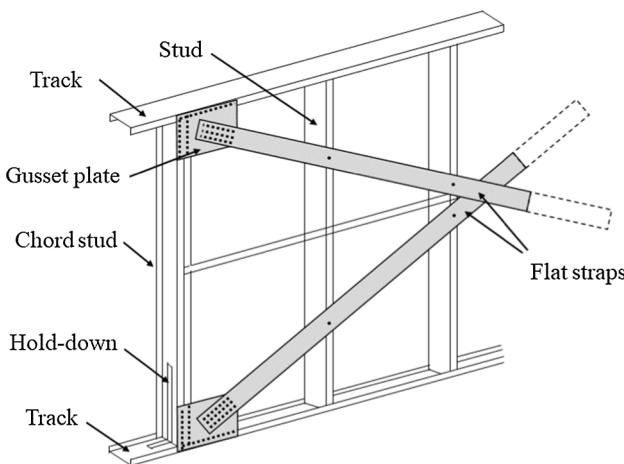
CFS framed shear wall with flat strap X-bracing (fastened detail shown, welded gusset plates and strap is also common).
